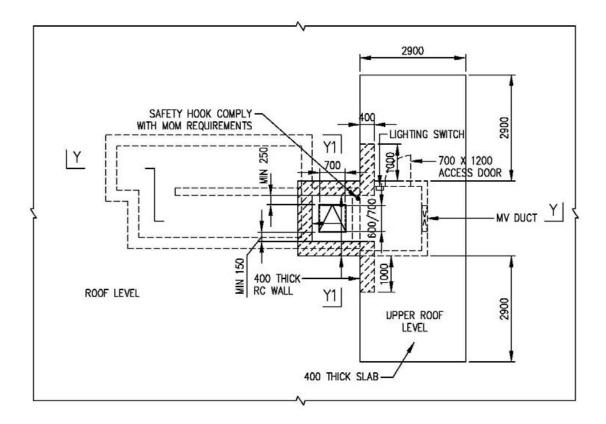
(a) PLAN OF S/C SS AT UPPER ROOF LEVEL
